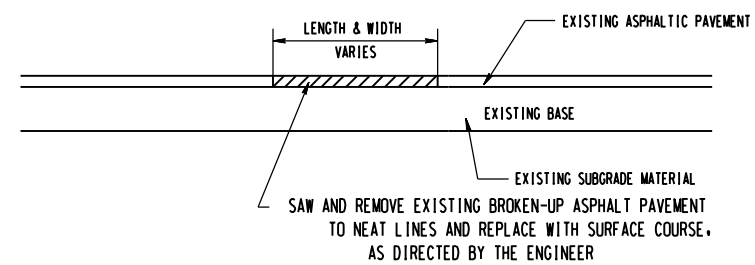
## DETAILS OF REPAIRING EXISTING PAVEMENT PRIOR TO RESURFACING FOR FULL DEPTH AND MILLING
